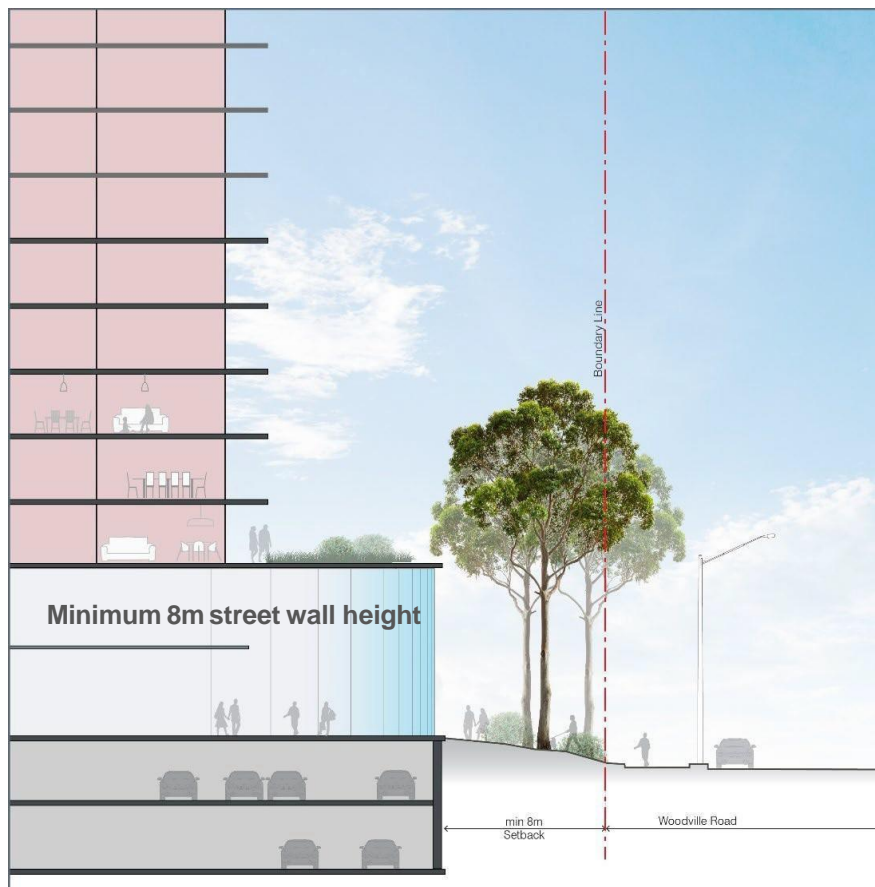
Illustrative section – minimum street wall height for buildings on Woodville Road
